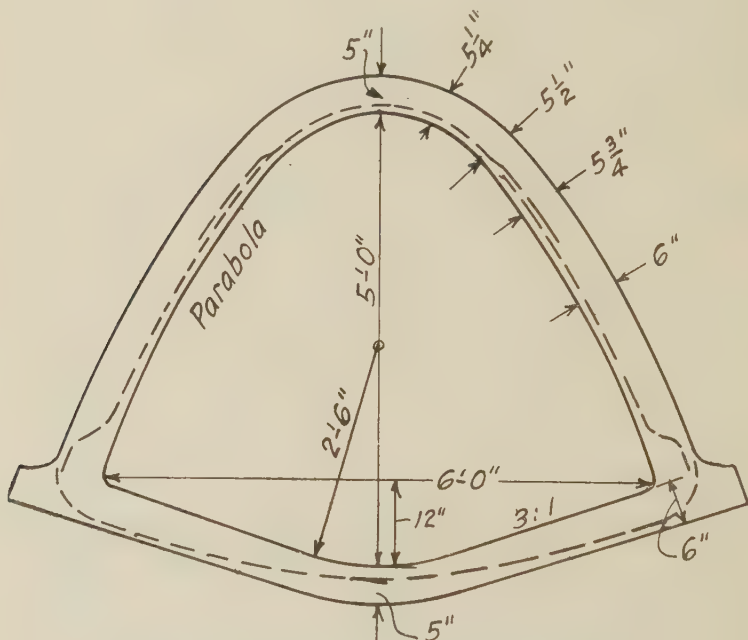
TYPICAL PARABOLIC OR DELTA SECTION, HARRISBURG.
